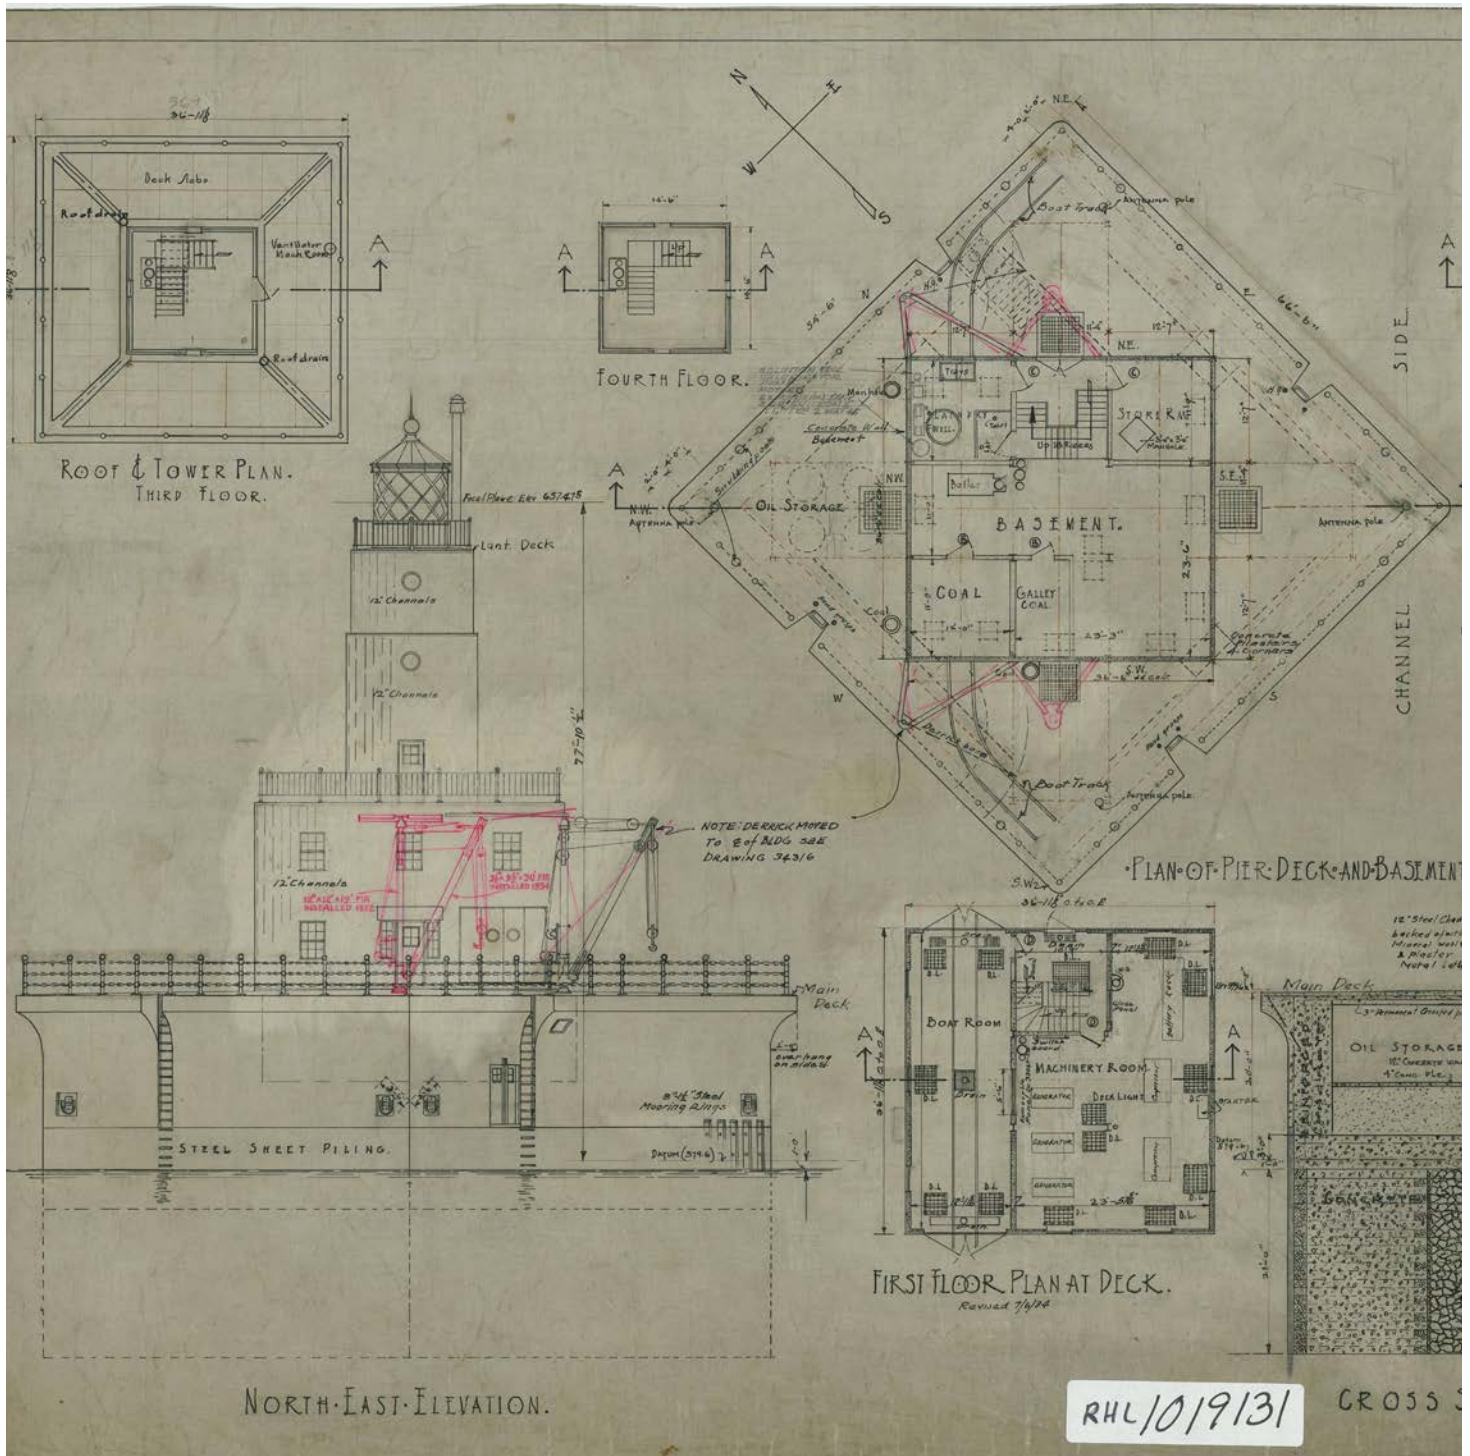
B-30: Construction drawing showing the revised locations of the boat derricks.
